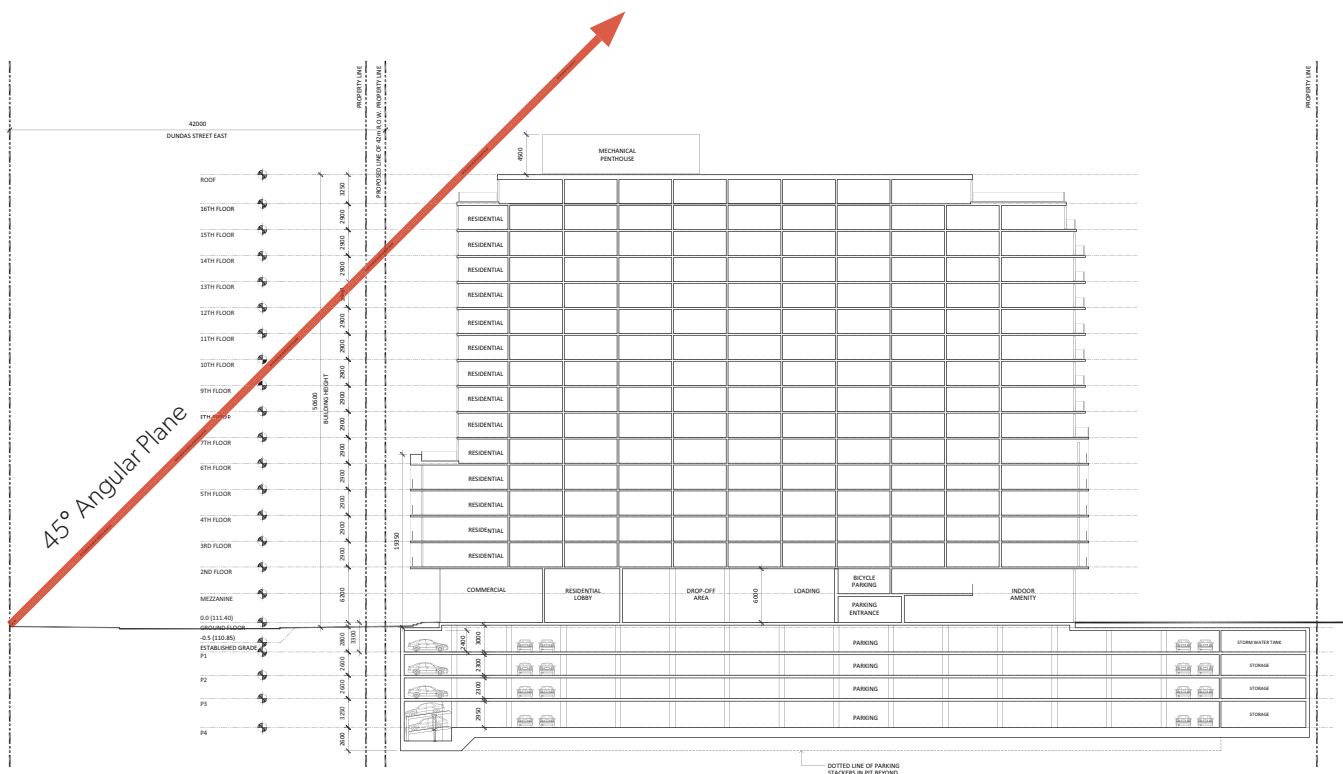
Section A Showing 45° Angular Plane: Section Prepared by Studio JCI.
